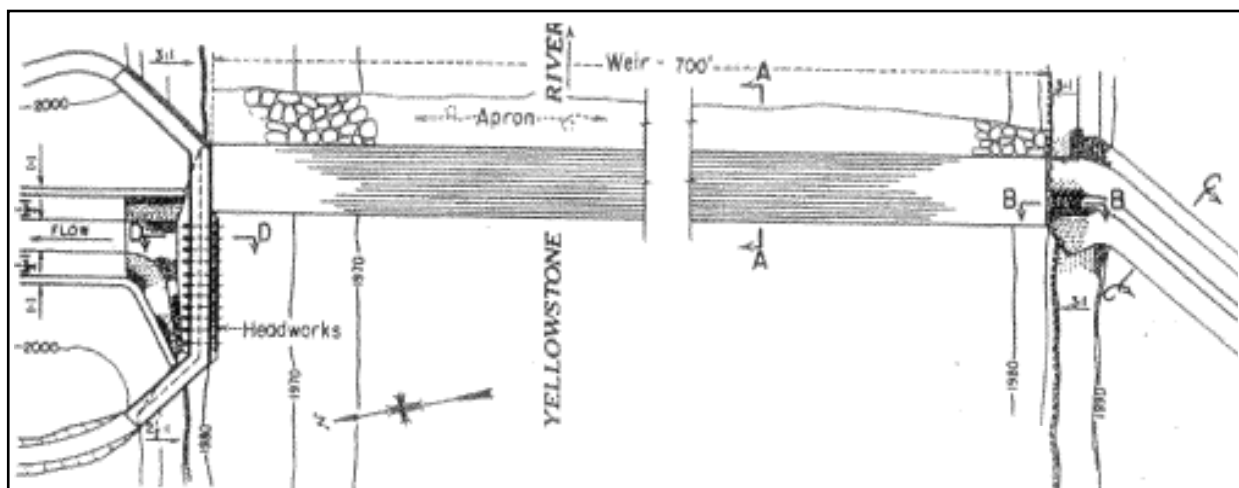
Original Design Plan View of Dam and Headworks (Reclamation)
